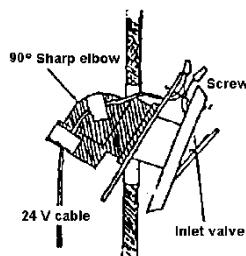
Installation of inlet valves in existing homes. Mount the top screw on the inlet valve and fix to backing plate. Connect the low voltage wire and tape it to a 90° sharp elbow. Tie a weight to the low voltage cable and lower it through the wall opening and the opening through which the tubing will run.
